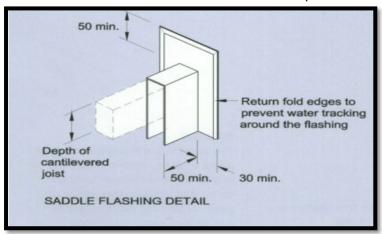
Sample of cantilevered deck joist saddle flashing; sourced from E2/AS1
